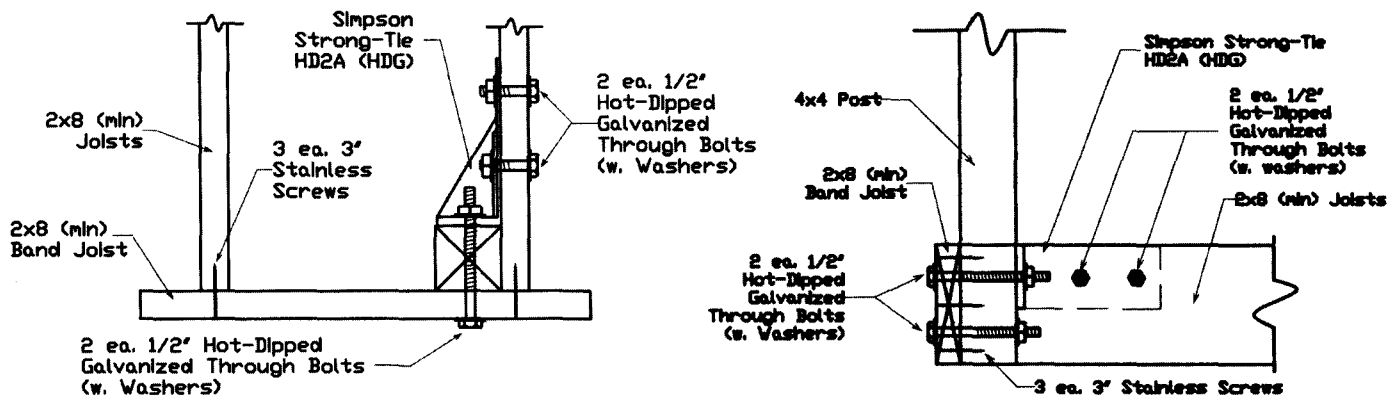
Guardrail post test assembly details for 4 by 4 southern pine posts inside of band joist.
